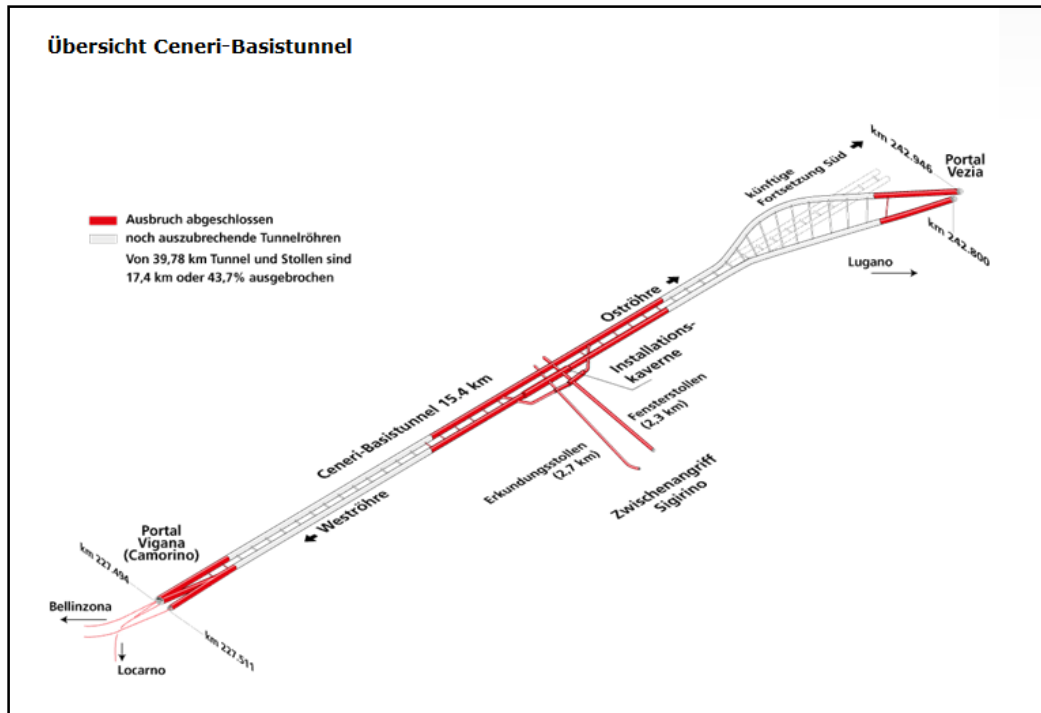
Drilling works at Ceneri Tunnel (01.01.2011)
